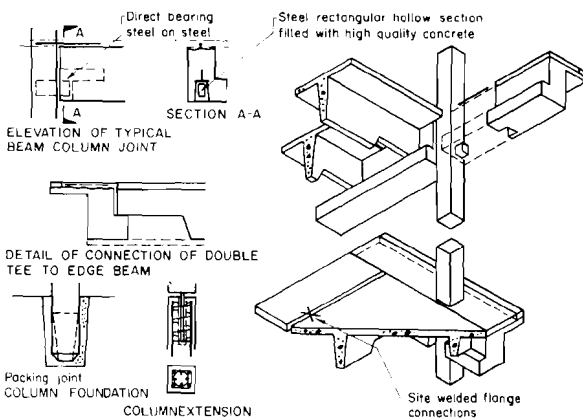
Details of standard building frame B.C.C.F. (Gifford).
